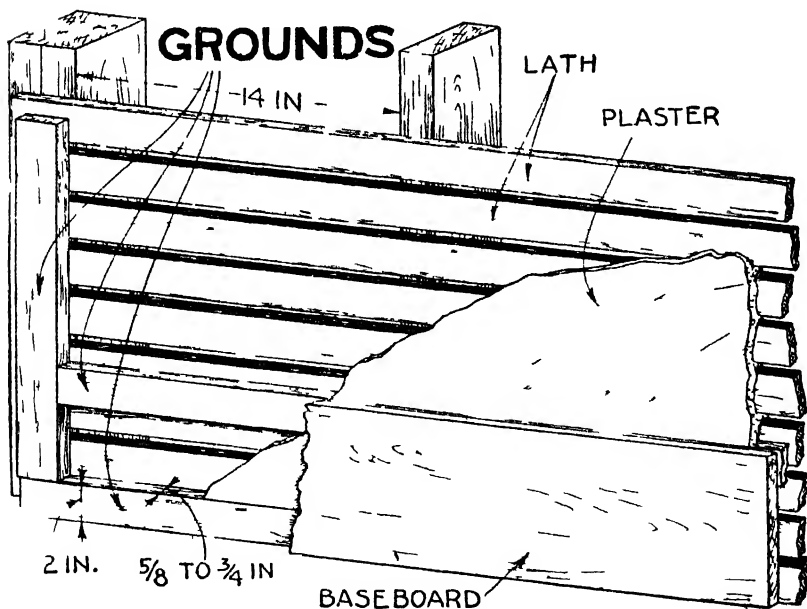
,448.—Section of plastered wall illustrating grounds. In order to keep out vermin and cold grounds for brick should be placed so that the wall may be lathed and plastered down to the floor.
